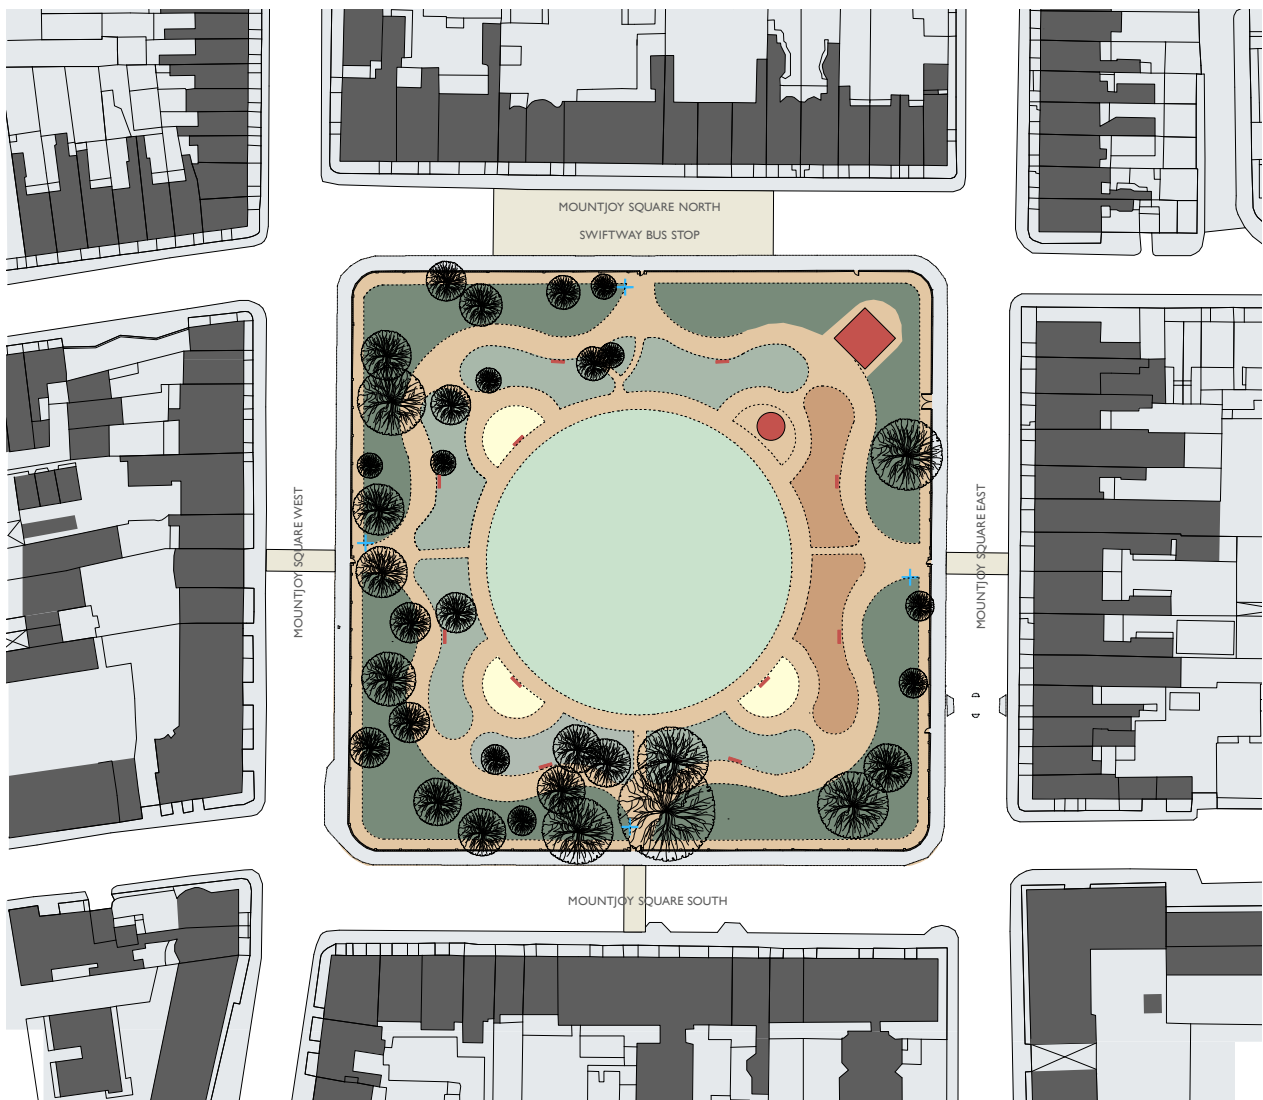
Plan showing proposed park restoration, new facilities and public realm improvements.
